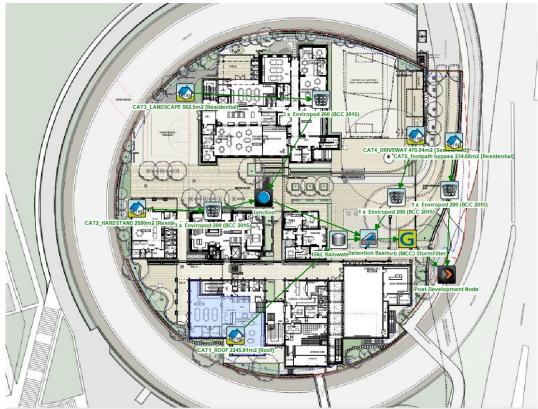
MUSIC Modelling Layout (Based on Architectural Plan Issued 06.12.2019)
